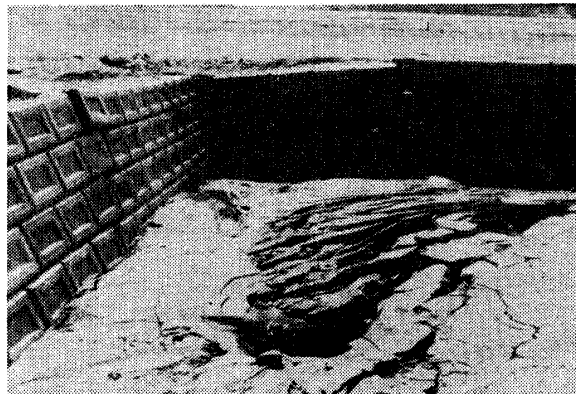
Bulged and collapsed retaining wall at a residential quarter (Site A-2)
